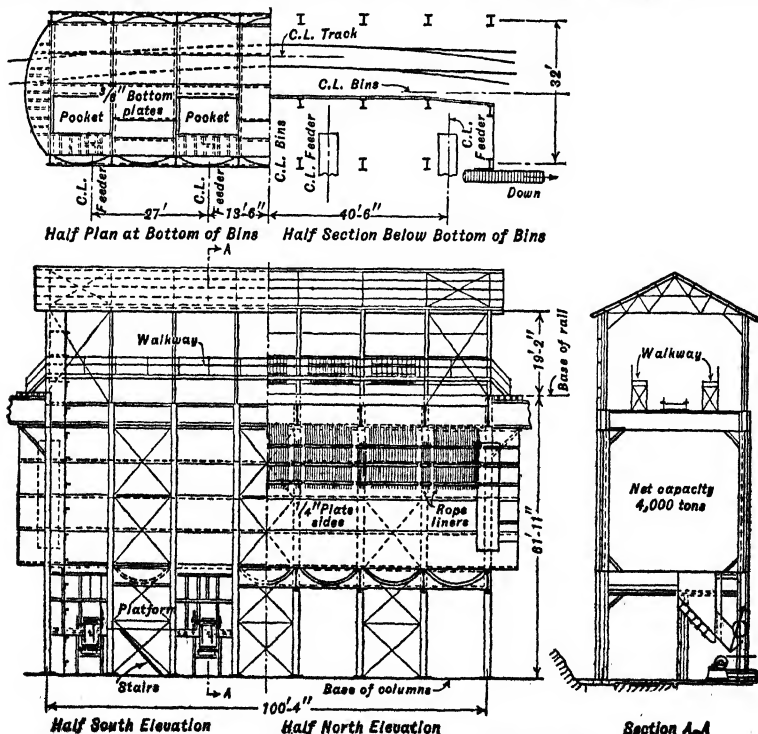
Steel bin at main shaft, INSPIRATION COPPER Co.
